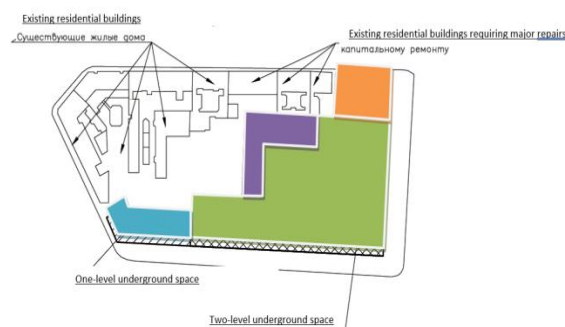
A building under construction with an underground car park in the central part of St. Petersburg
